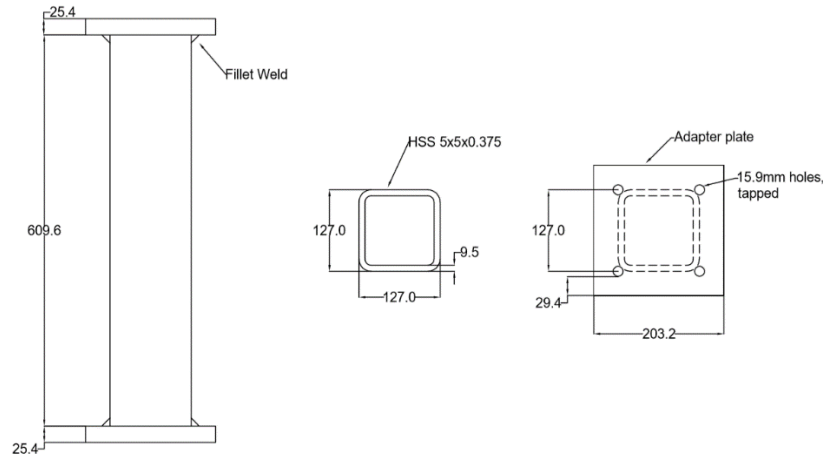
4: Plan and elevation details of the experimental substructure.
